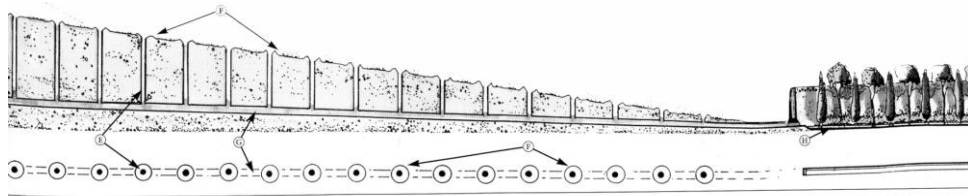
Up: A Cross Section Down: A Plan of a Qanat
